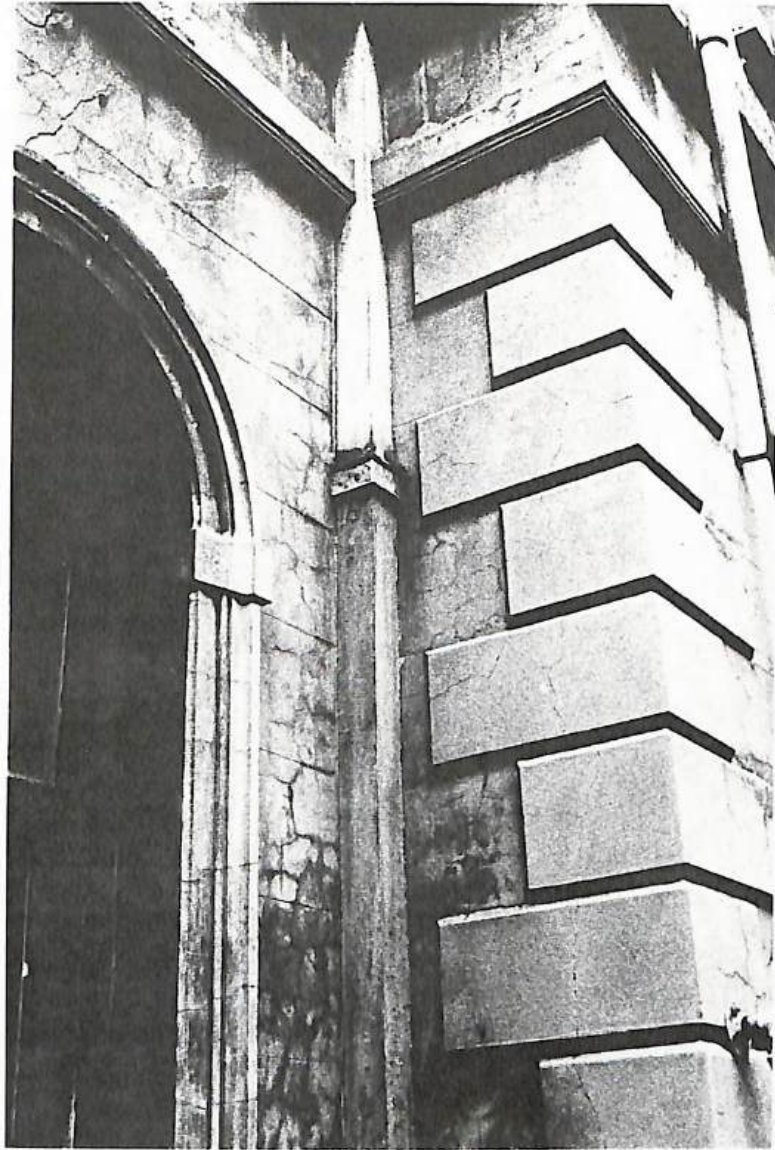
Render Quoining and Mouldings, West Wall, 1989. (PSD)
